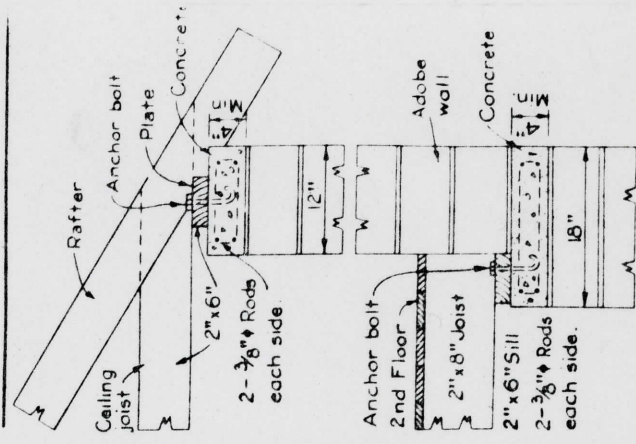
Cross section of wall showing continuous concrete beams with 3/8-inch reinforcing rods.
